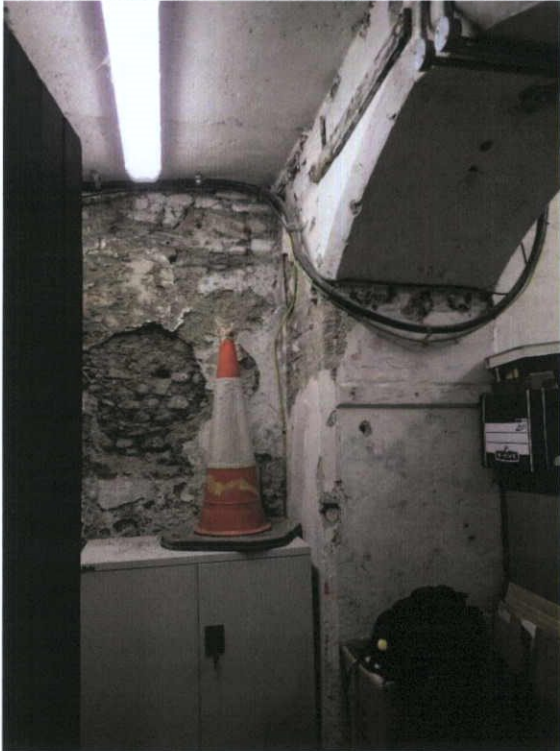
View of a brick pier at the front of the property at basement level, with a rendered Calp limestone masonry wall.
